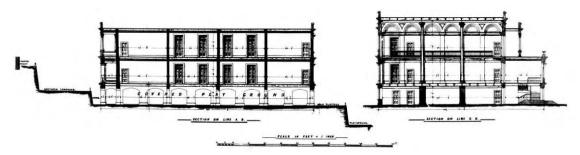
Section of Victoria College (renamed as Queen's College in 1894) in 1889.
